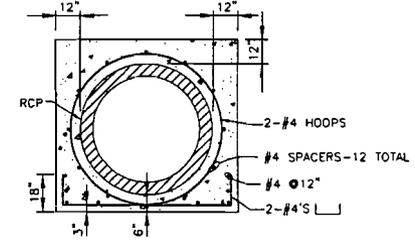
OUTFALL WITH ROCK SLOPE PROTECTION SCALE: NTS
